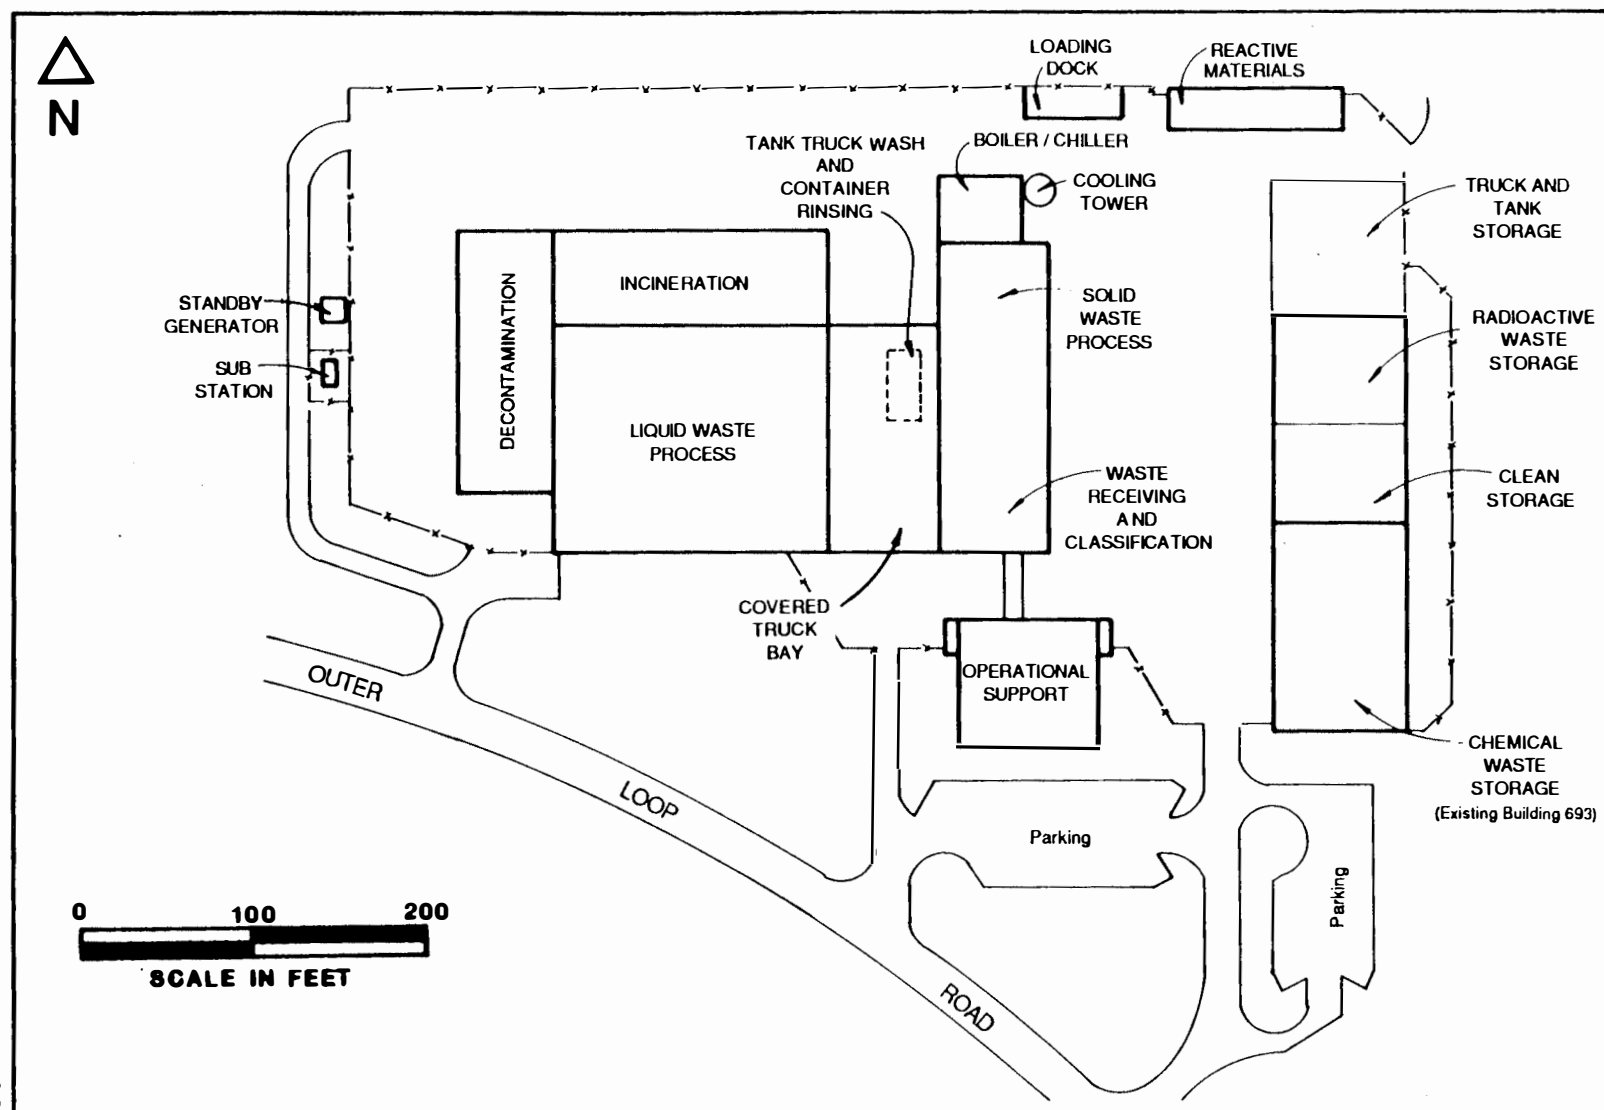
Layout of the Proposed DWTF at the Preferred Location, Site D
